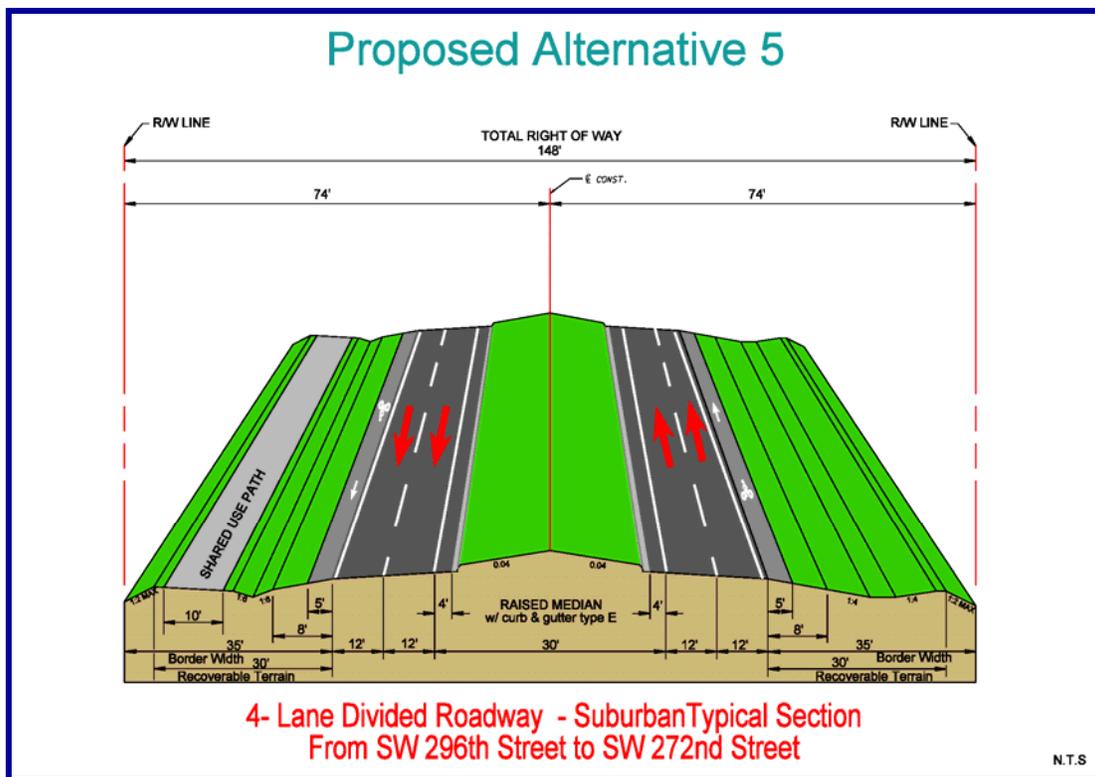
Alternative 5 Proposed Typical Roadway Section (Suburban)
